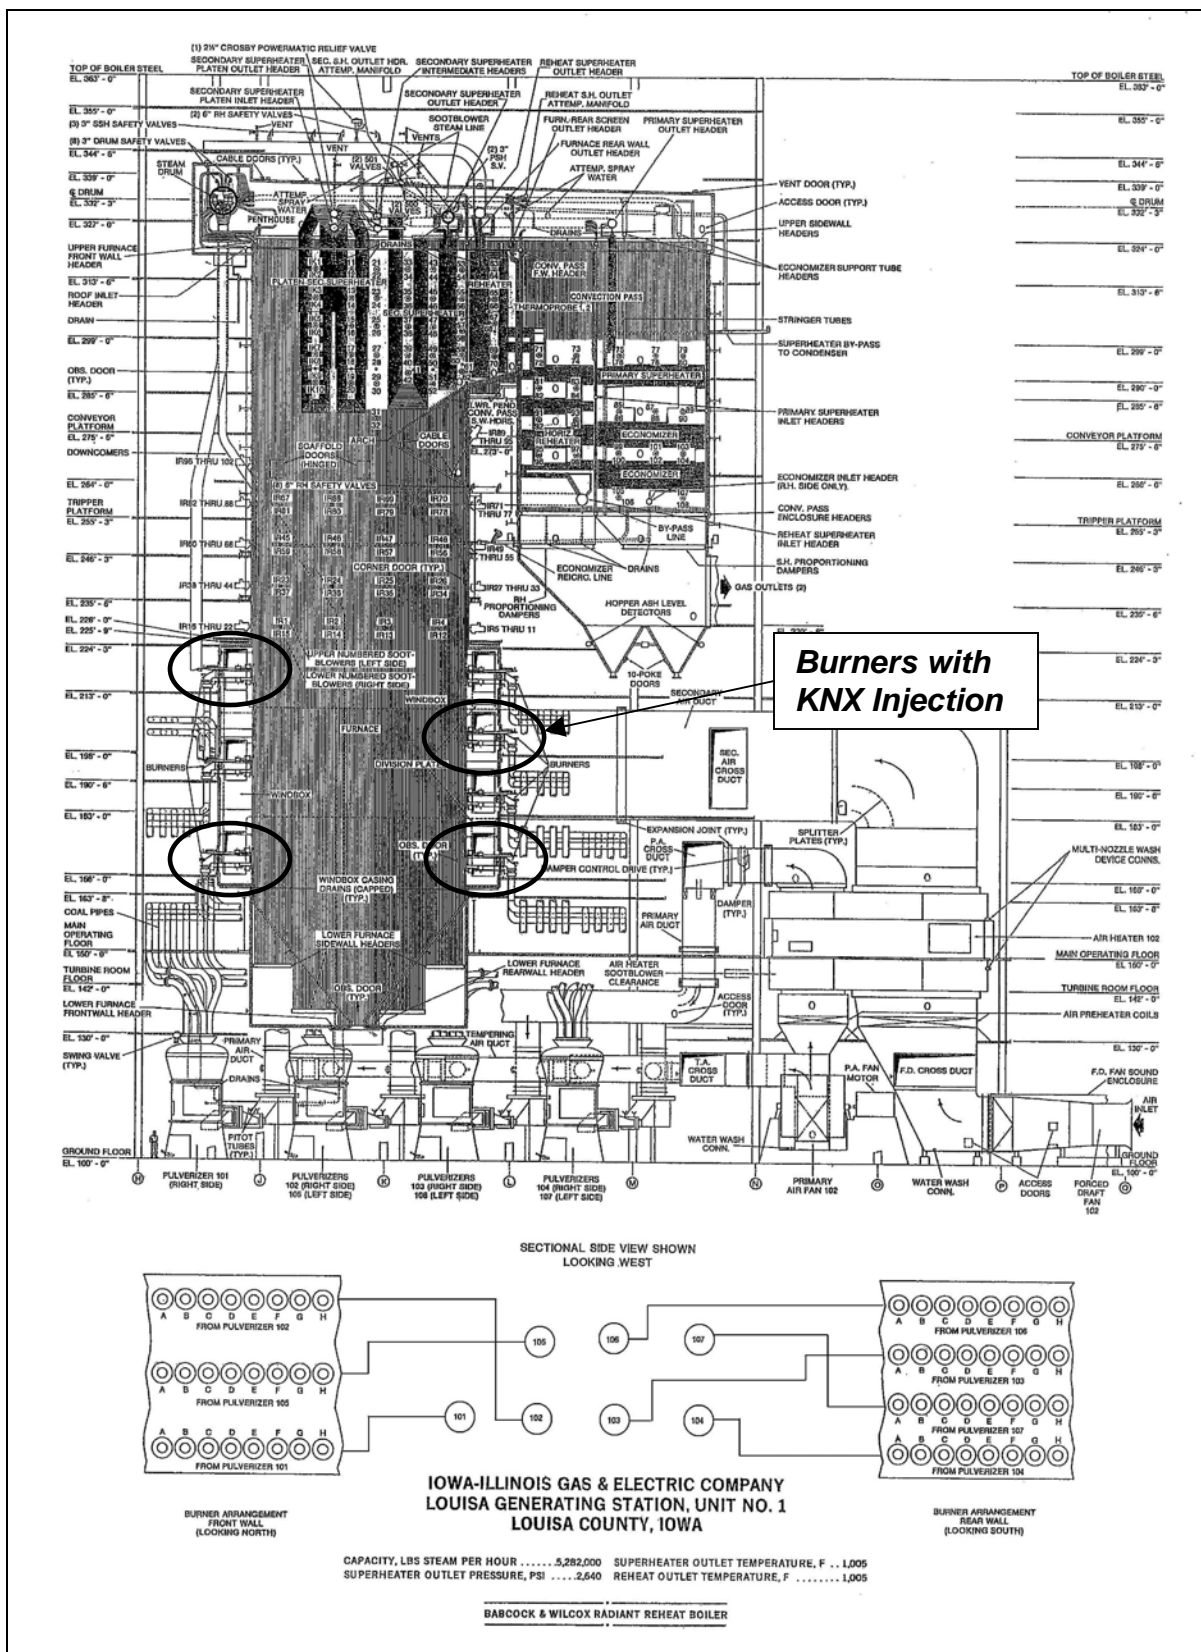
Louisa Boiler with Mill and Burner Arrangement.
